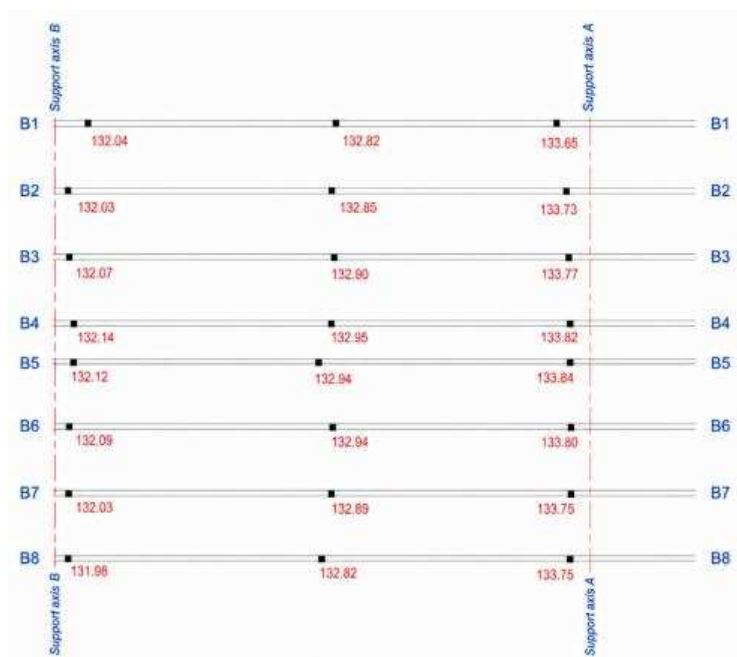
Diagram of spatial reference and vertical alignment of the bridge superstructure girders: 1–8 — numbers of longitudinal reinforced concrete girder lines (B1–B8); Support A, Support B — alignments of support units. Note: In the mid-span area, a stable distribution of geometric elevations within 132.82–132.95 m was recorded
